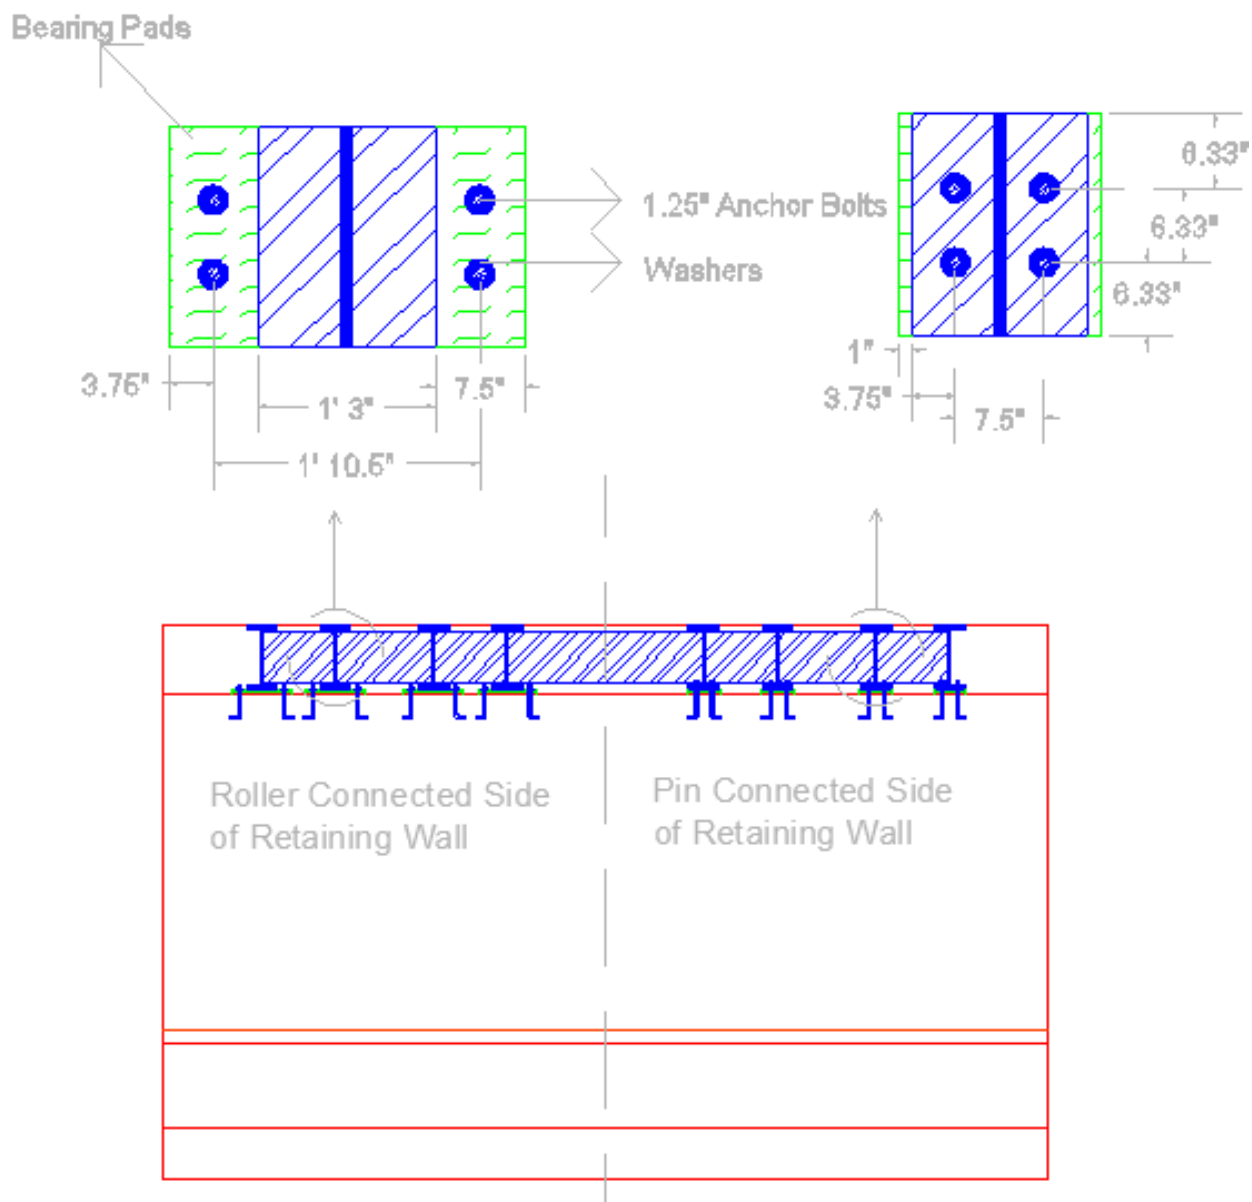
Drawing #9: Connection of the Superstructure and Substructure
